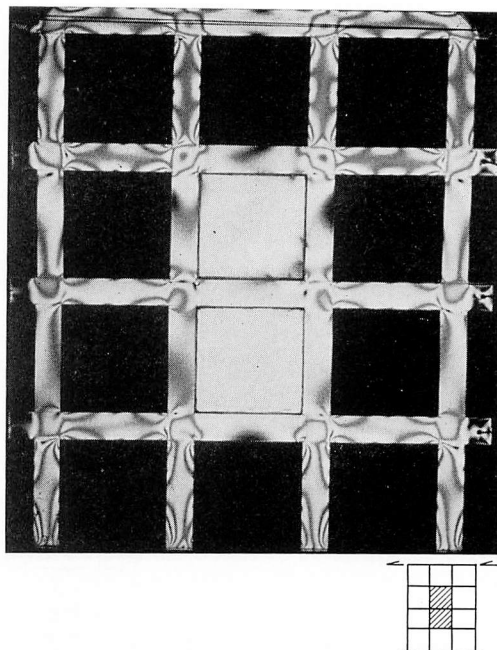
a Isochromatics of Fame with two Wall Panels Subjected to Lateral Forces on Roof Beams
